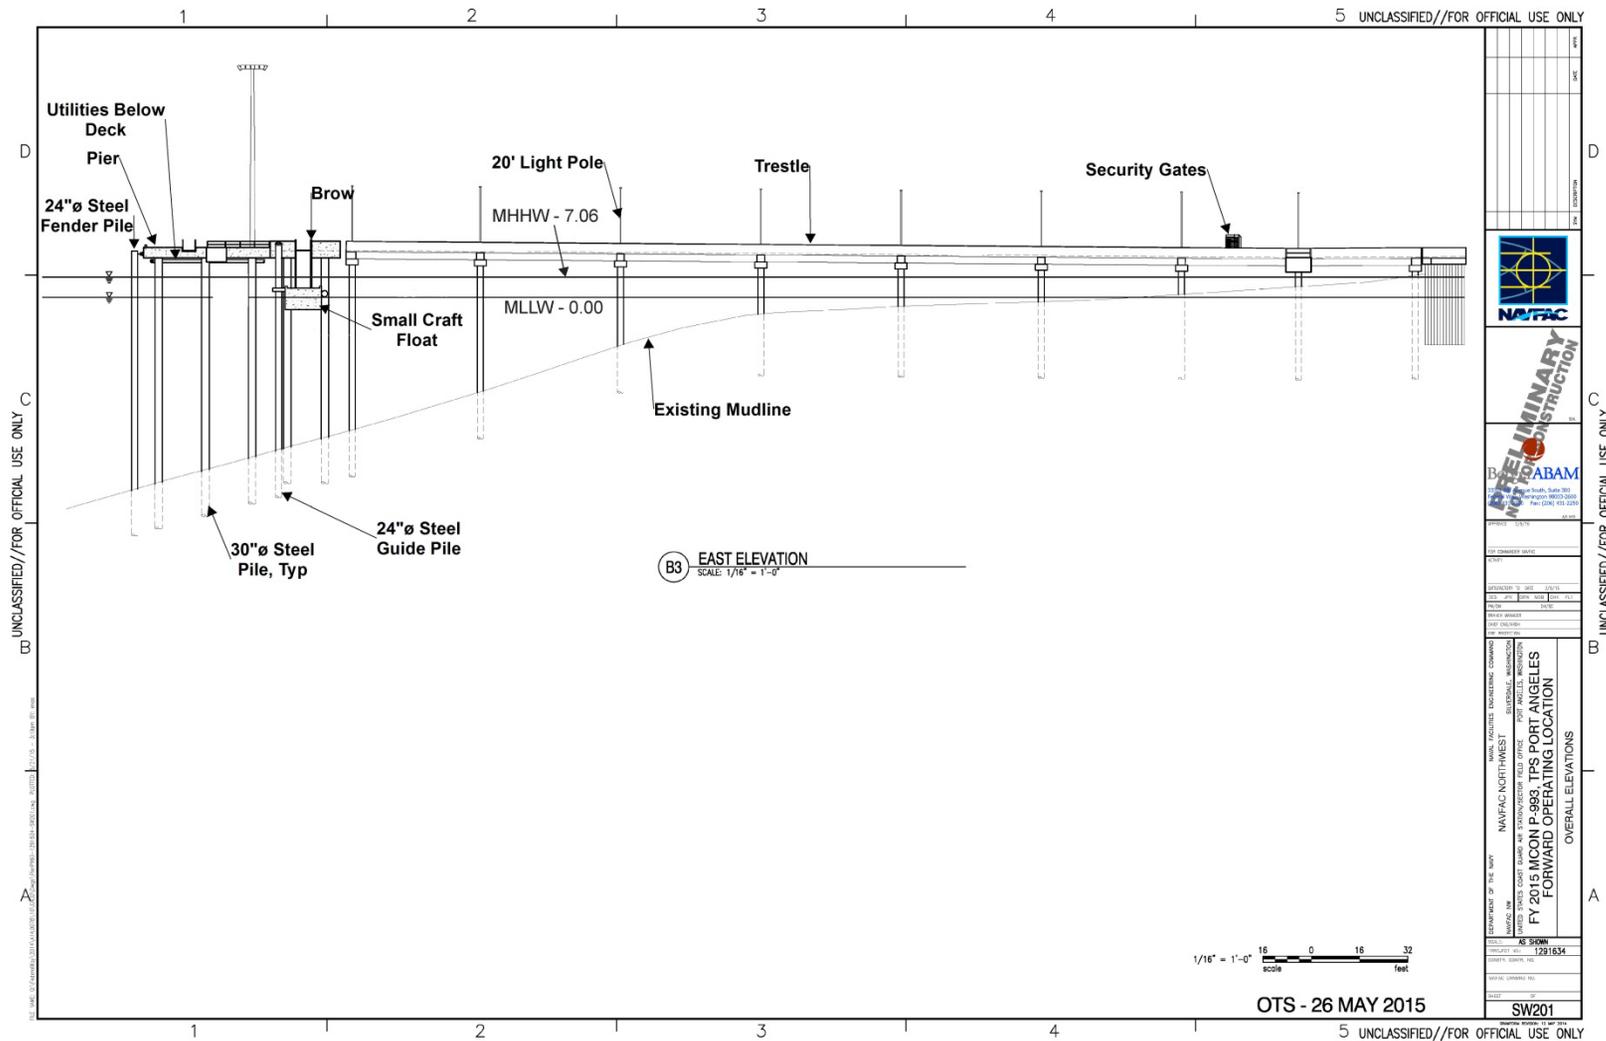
Alternative 1 – Trestle, Transfer Span, and Fixed Pier
